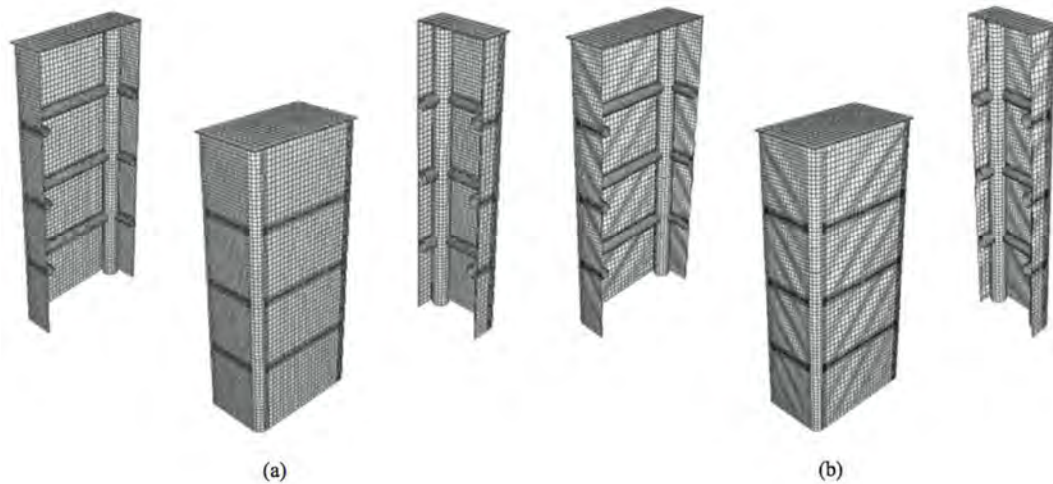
Finite Element Model Showing (A) The Pier in its Undeformed State; And (B) The Pier After Being Laterally Loaded to its Capacity (Keller and Bruneau, 2009)
